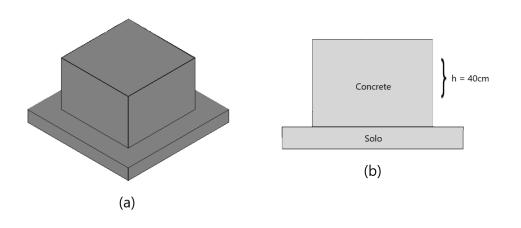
Simple foundation. (a) Simple foundation: Concrete block. (b) Dimension of foundation used.
